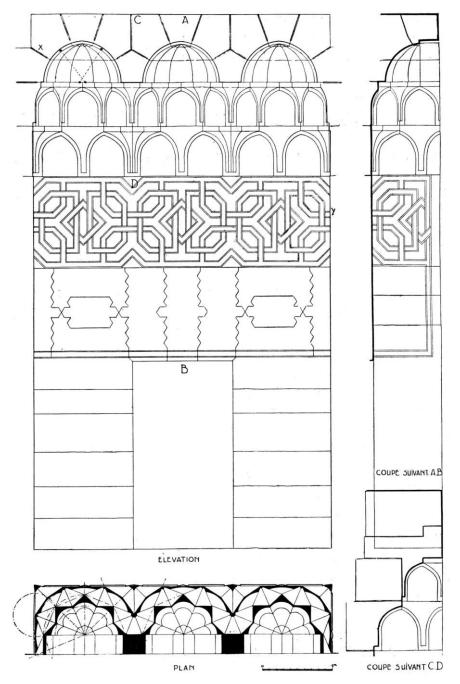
Syria, Castle of Ṣahyūn, elevation, plan and section of the portal (Écochard, 'Notes d'archéologie', p. 102).
